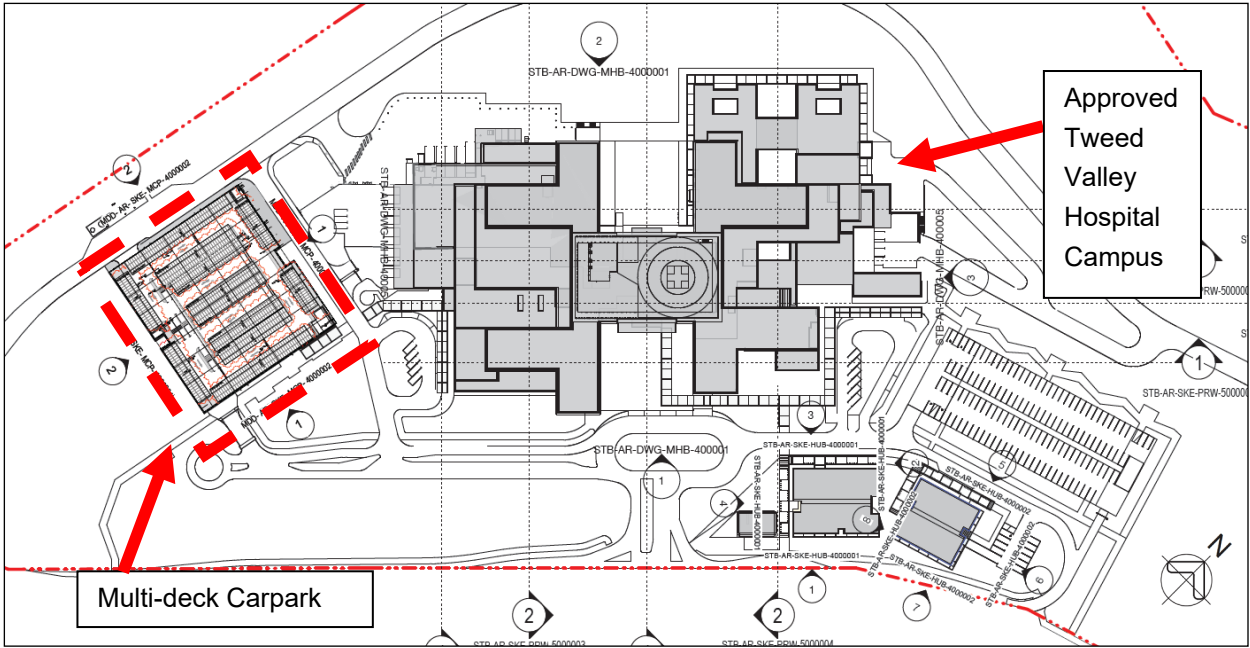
| Site plan (Base source: SSD-10353-Mod-3 Architectural Plans)
